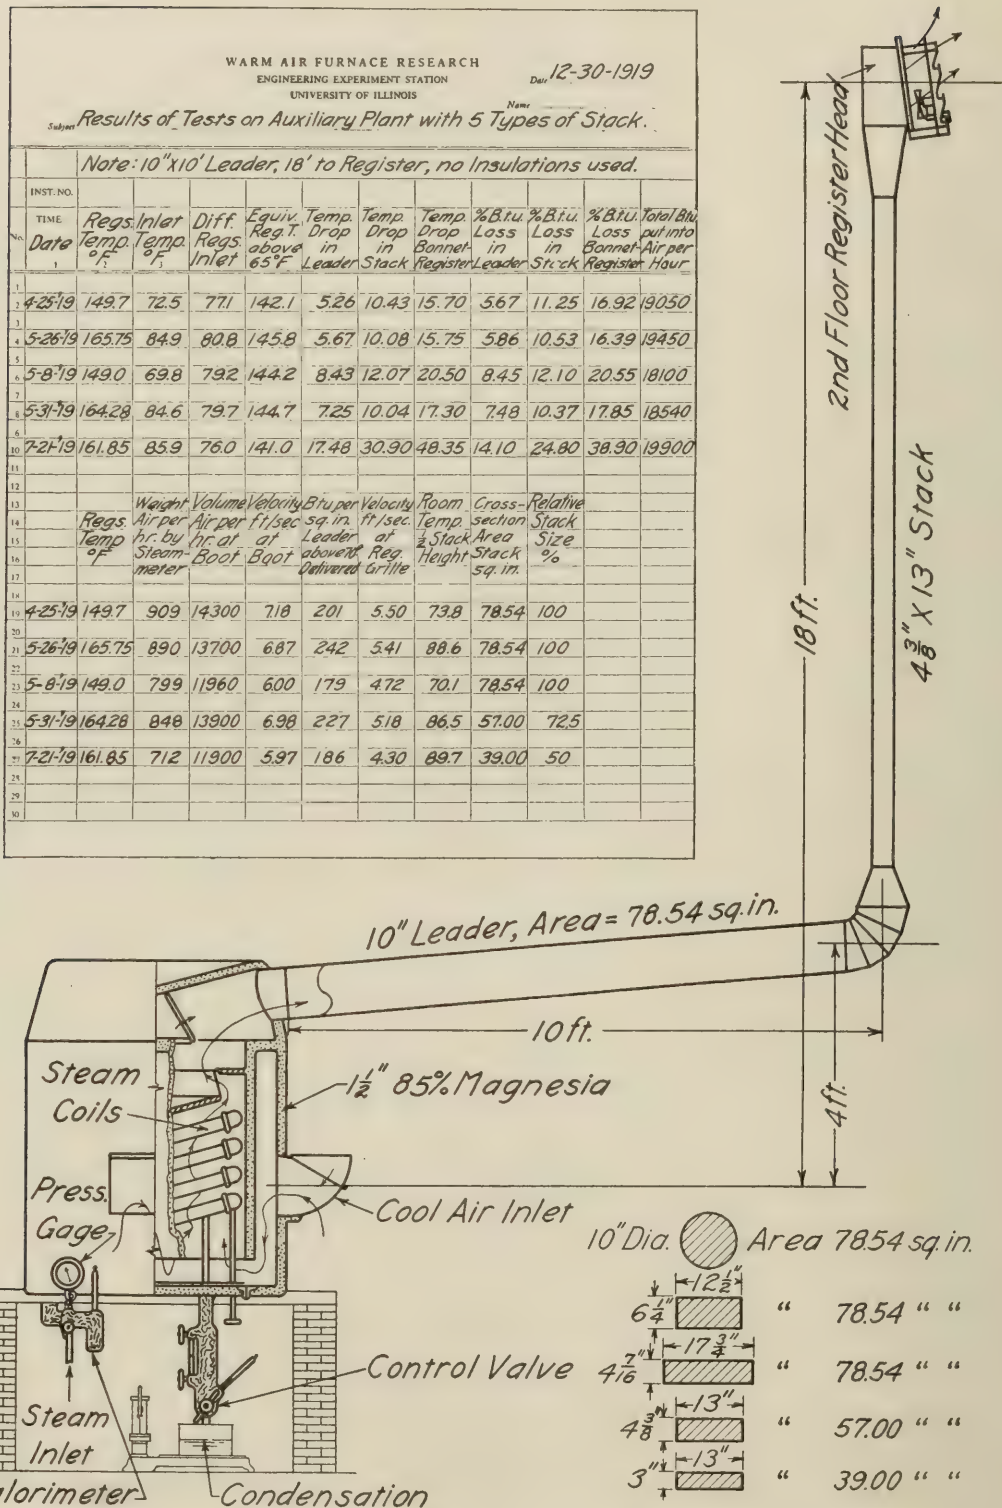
SECTIONAL ELEVATION OF SINGLE LEADER PLANT FOR TESTING STACKS
